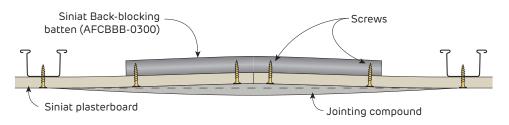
Creating a Recess on a Ceiling Butt Joint using Back-Blocking Battens Section
